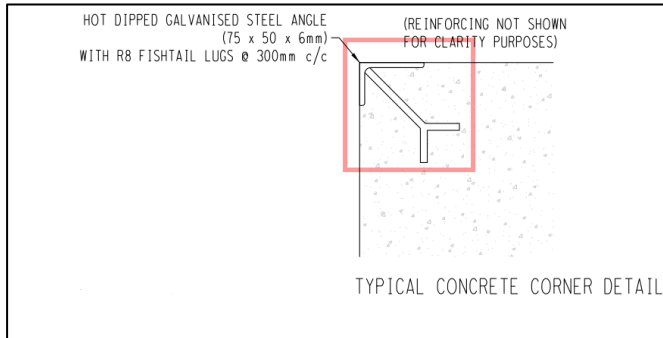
Excerpt showing the protected concrete slabs corner/edge typical detail
